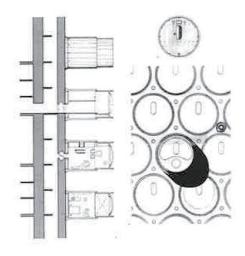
Elevation and section, floor plan for residential unit, Kiyonori Kikutake, 1963
